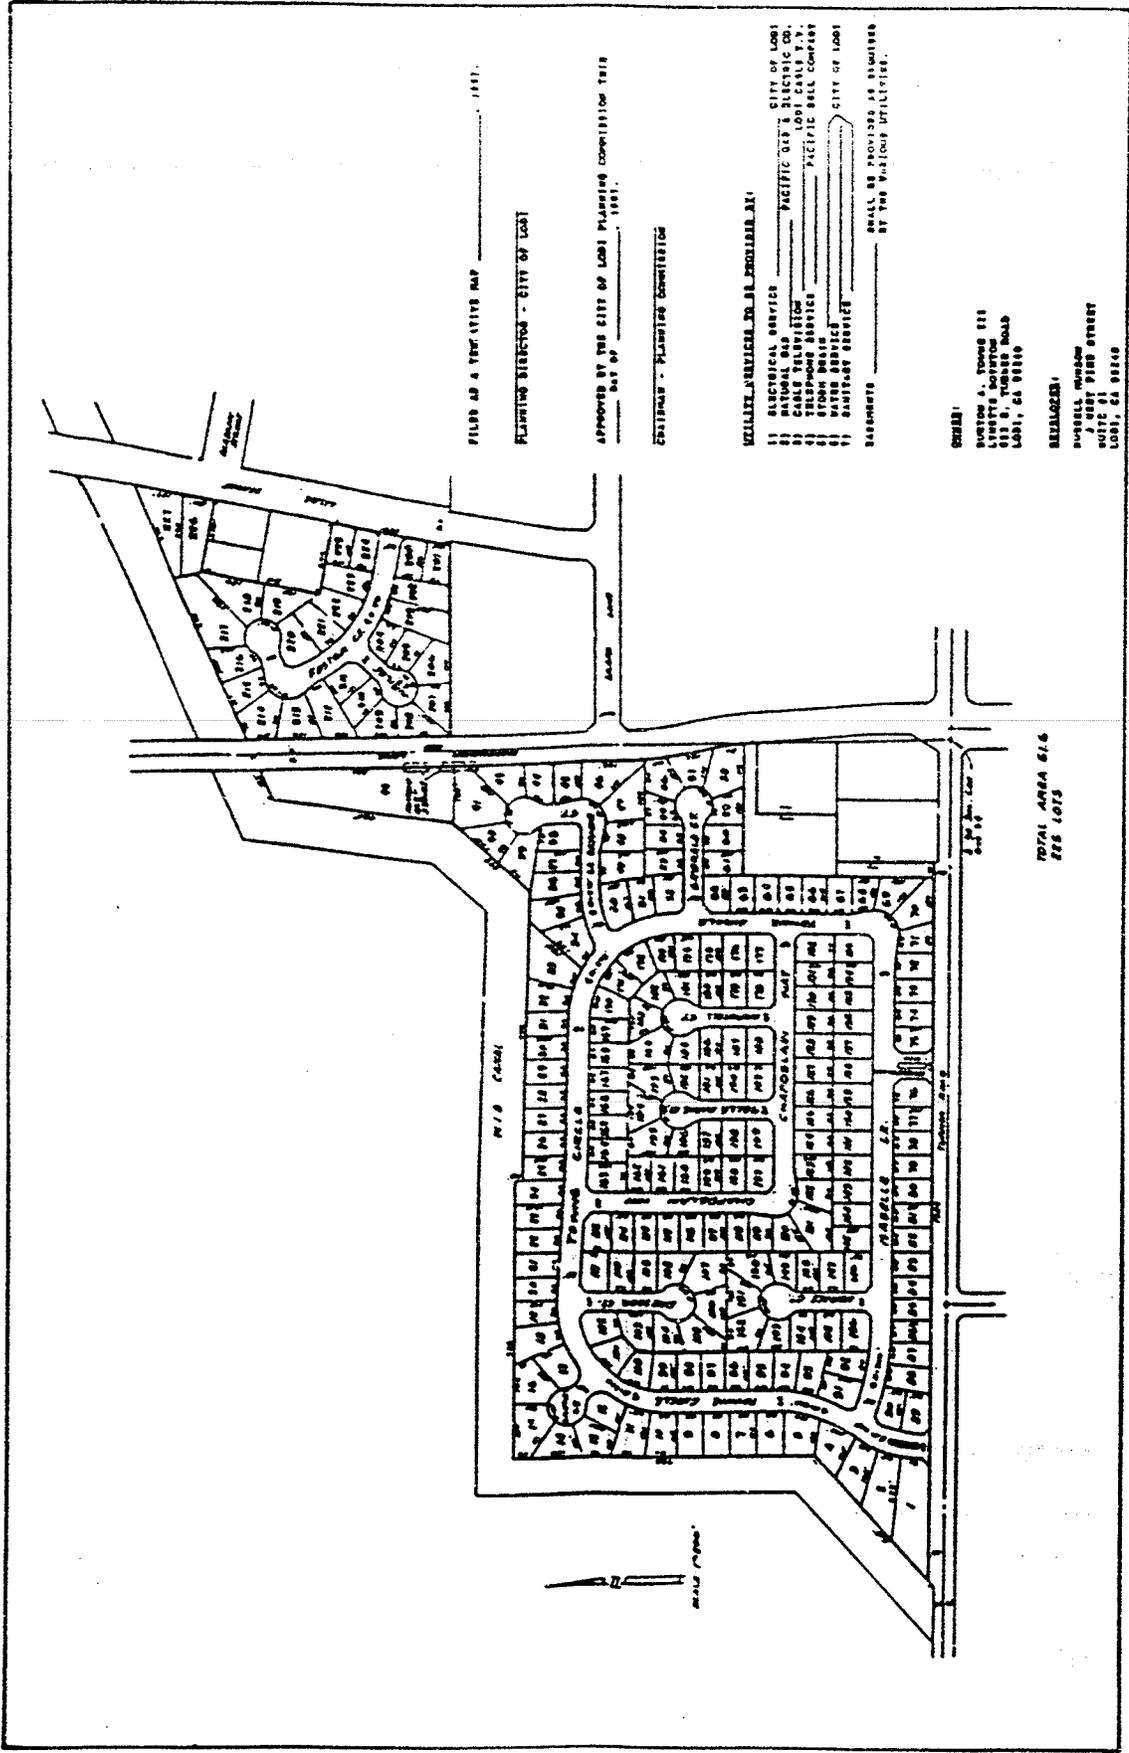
BRIDGETOWNE ESTATES PROPOSED SITE PLAN
